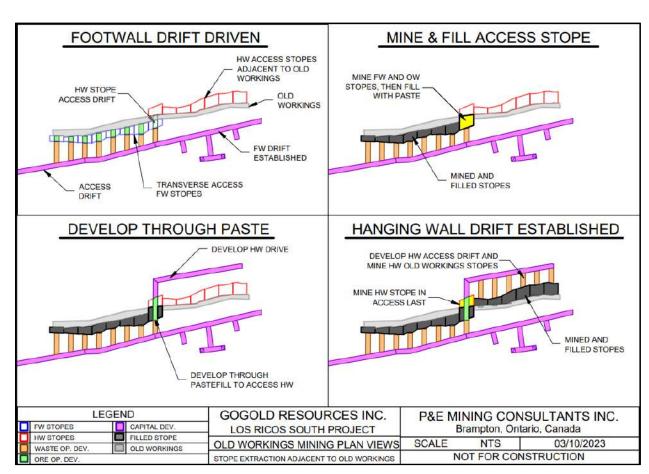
TRANSVERSE MINING AROUND OLD WORKINGS
